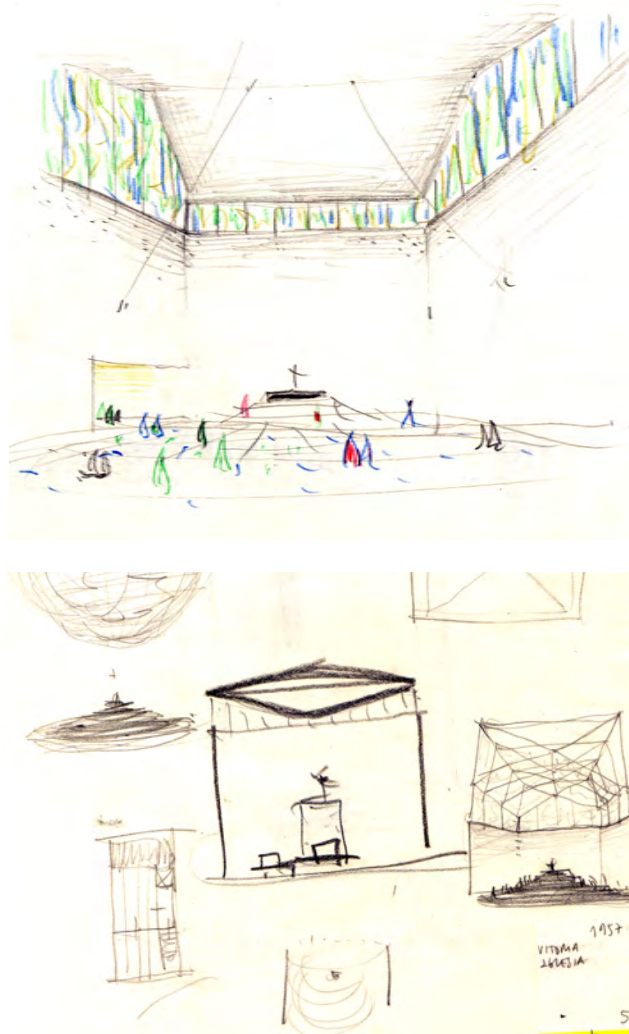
Sketch drawings of church interior, looking up to the spatial steel roof structure. New Parish, Vitoria, 1957, by Alejandro de la Sota.
